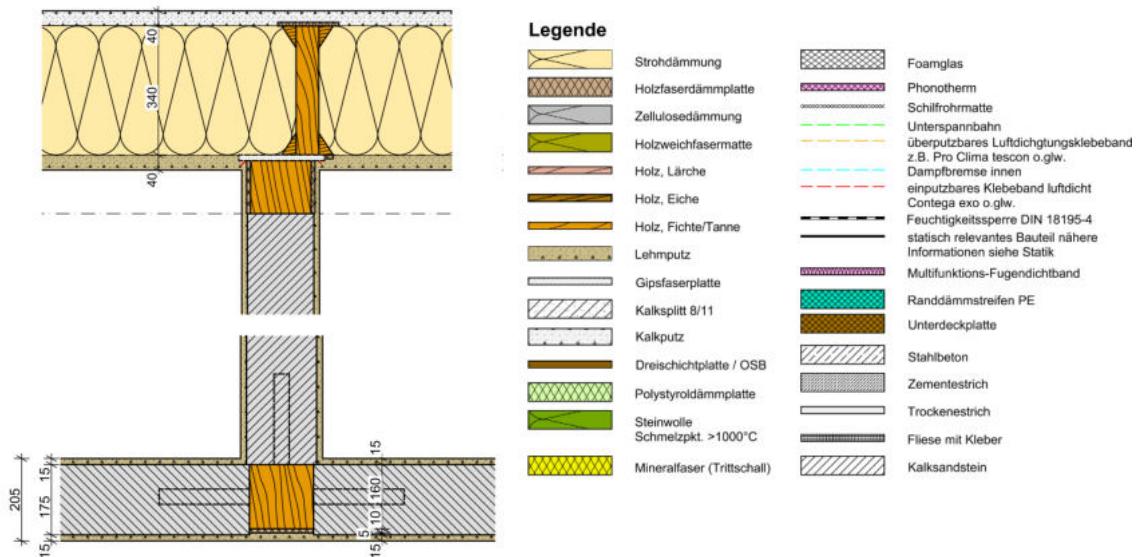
Component structure of the examined guest room wall with connection to exterior wall (top), joint between corridor and guest room wall (bottom)
